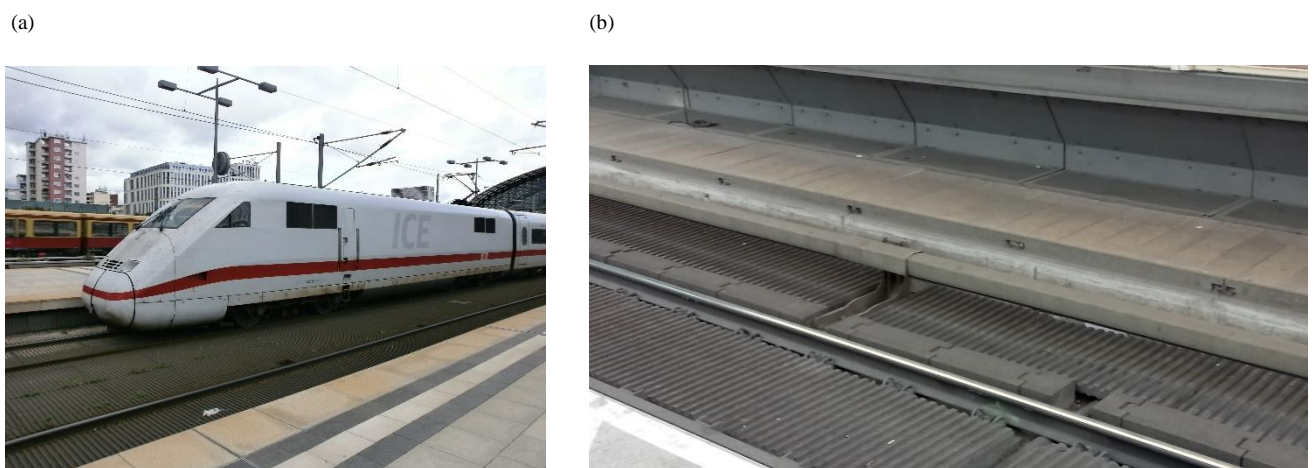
Rail dampers - Berlin Central Station (de. Berlin Hauptbahnhof) (own photograph):
